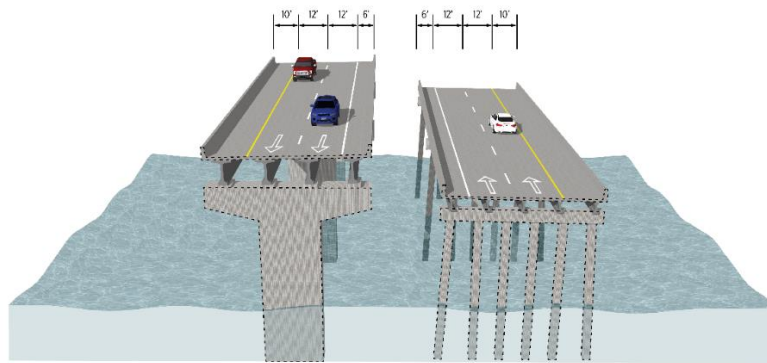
Existing Bridges Typical Section – Segment 2 – Gandy bridges
